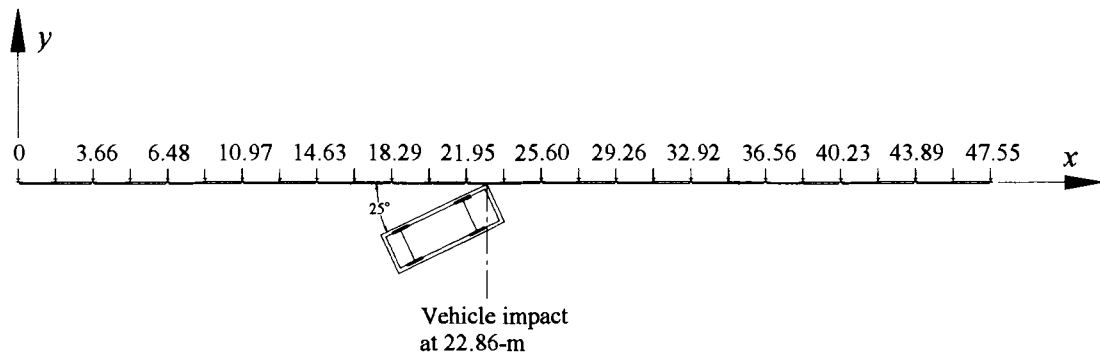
Guardrail System Layout (all dimensions in meters)
